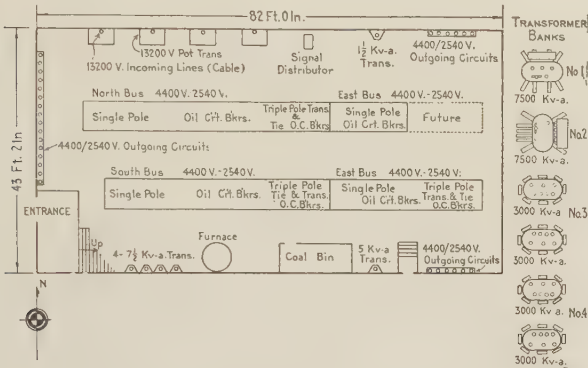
FIRST FLOOR PLAN OF AUTOMATIC SUBSTATION “E”, KANSAS CITY POWER & LIGHT CO.
